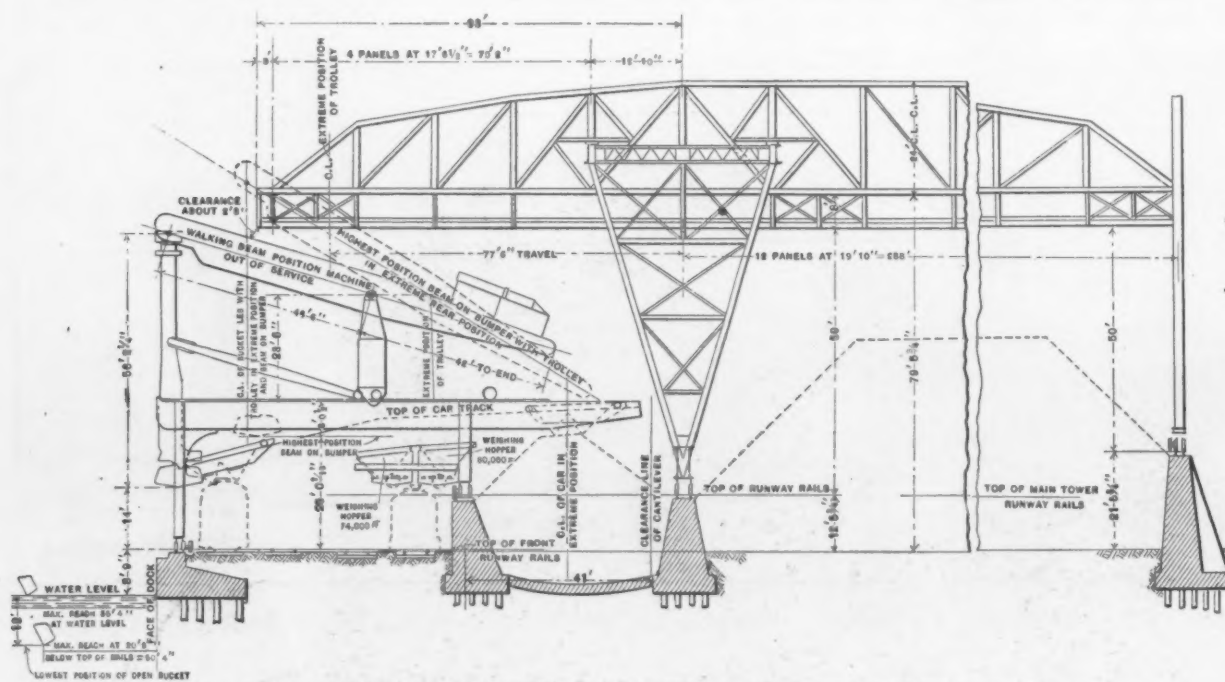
Section of Unloaders and Ore Bridge, Showing Extreme Positions of Walking Beam and Leg.
